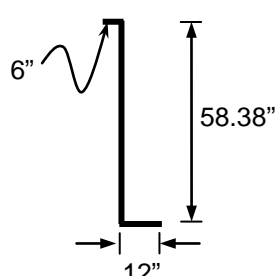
Vertical shear reinforcement near girder end (ALDOT 1988; Swenson 2003)
